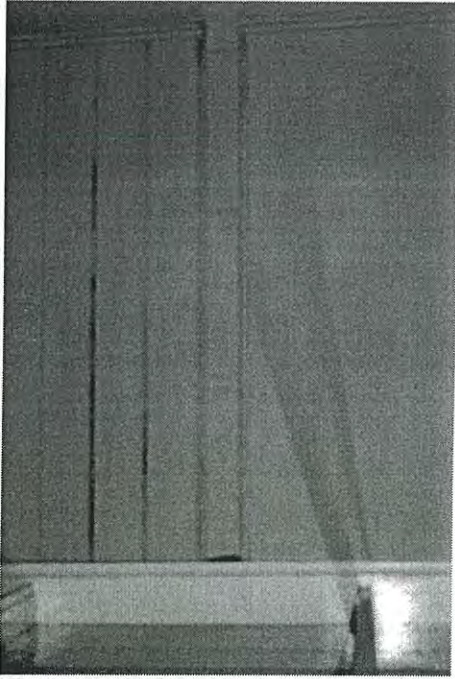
Interior, Landing & Stairs (space FF12). Detail of notched ceiling member that may indicate the location of an early screen/partition that has subsequently been removed.
